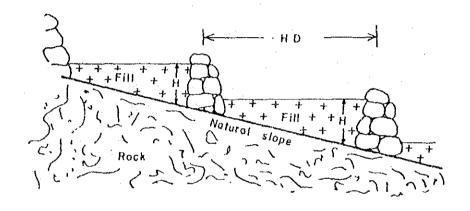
Sketch of Bench Terrace Constructed by Fill
